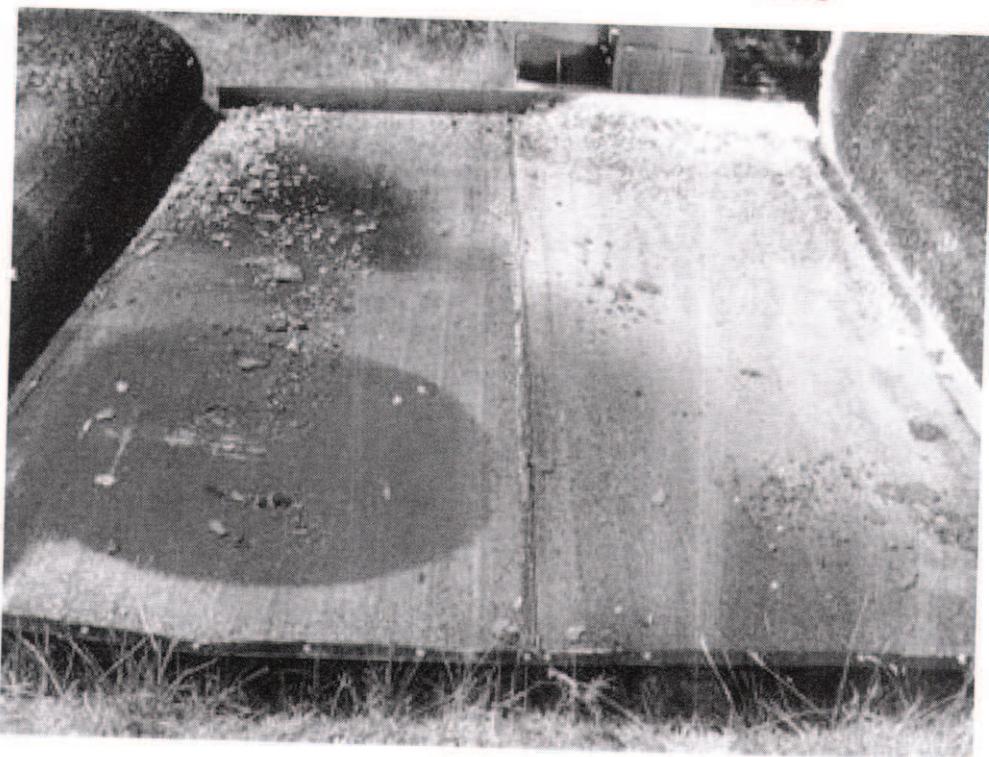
Equivalent ceiling test from BRANZ NZFSC Report No. 45
